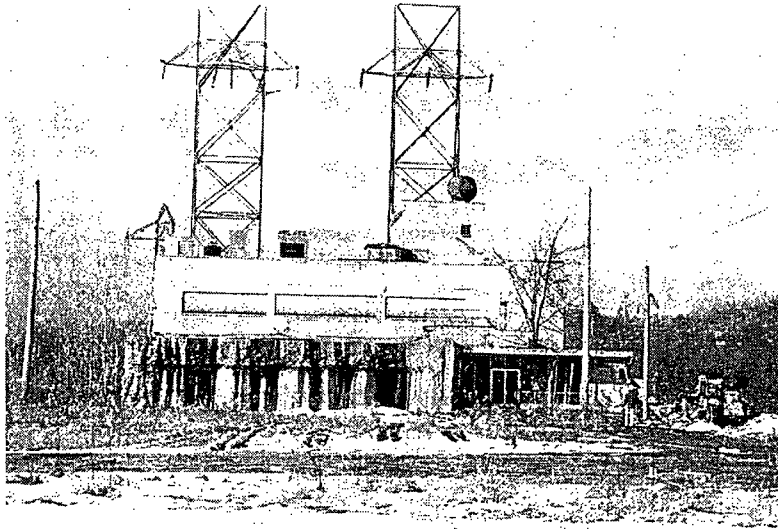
SAPS administration building. Control room is located in this building, behind on lower level. Auxiliary chamber enclosure wall is visible in foreground.
